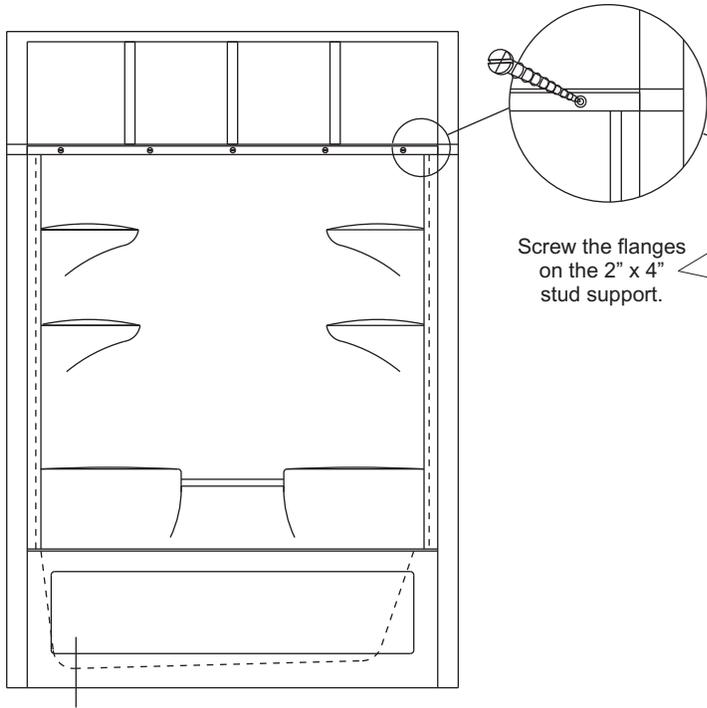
BA5 FASTENING WITH DRYWALL SCREWS
